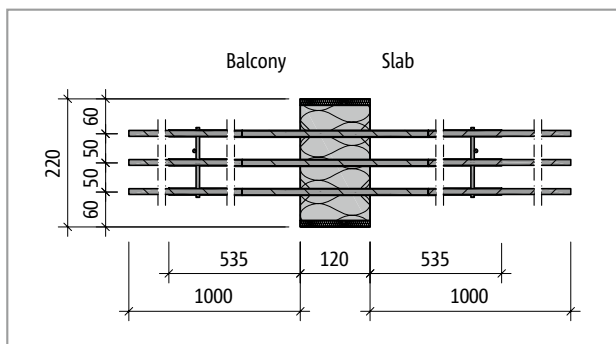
Schöck Isokorb® XT type B: Product plan view
